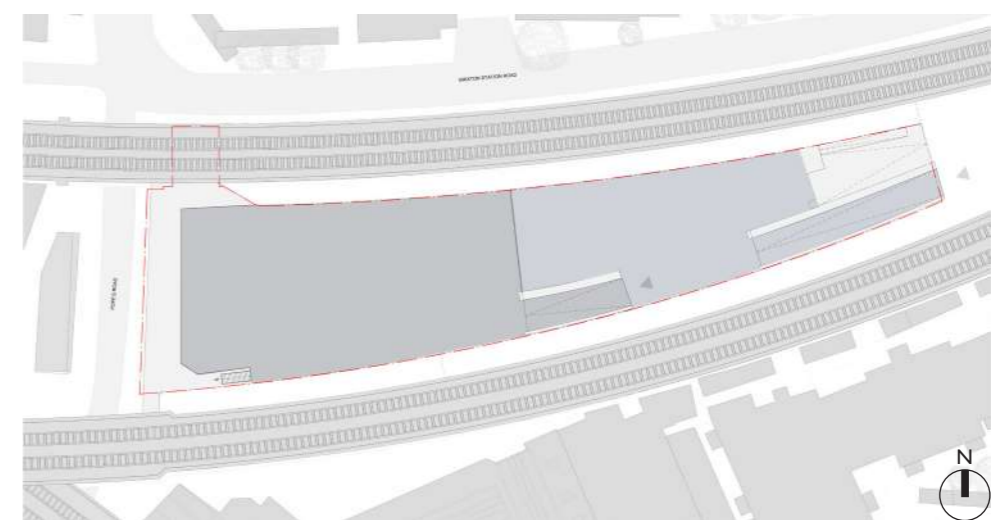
Existing Building Roof Plan - Uses
